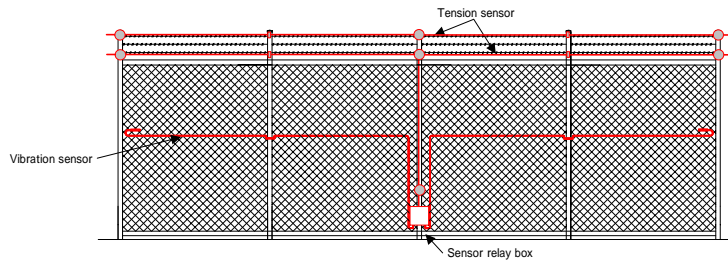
Example of Vibration Sensor + Tension Sensor Installation
